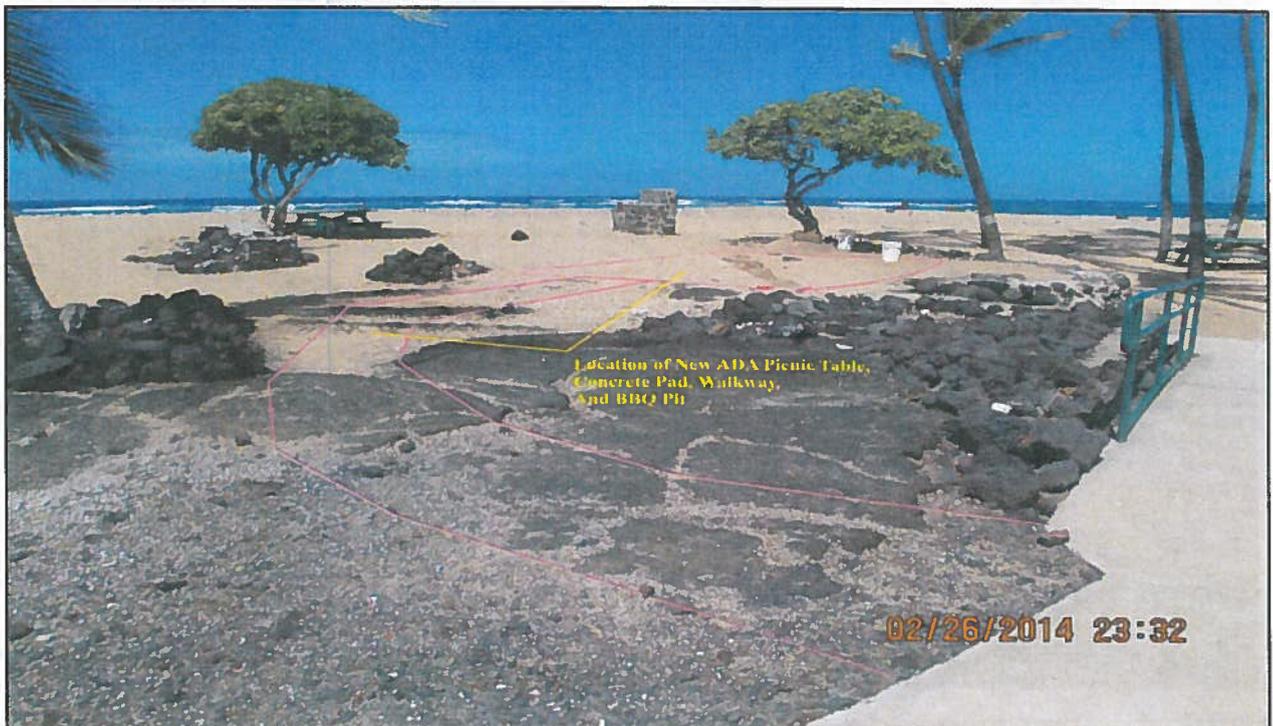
Location of the new ADA picnic table, concrete pad, walkway, and a new BBQ pit highlighted in pink, with the location of the walkway in the foreground. View is to the west (*makai*).
